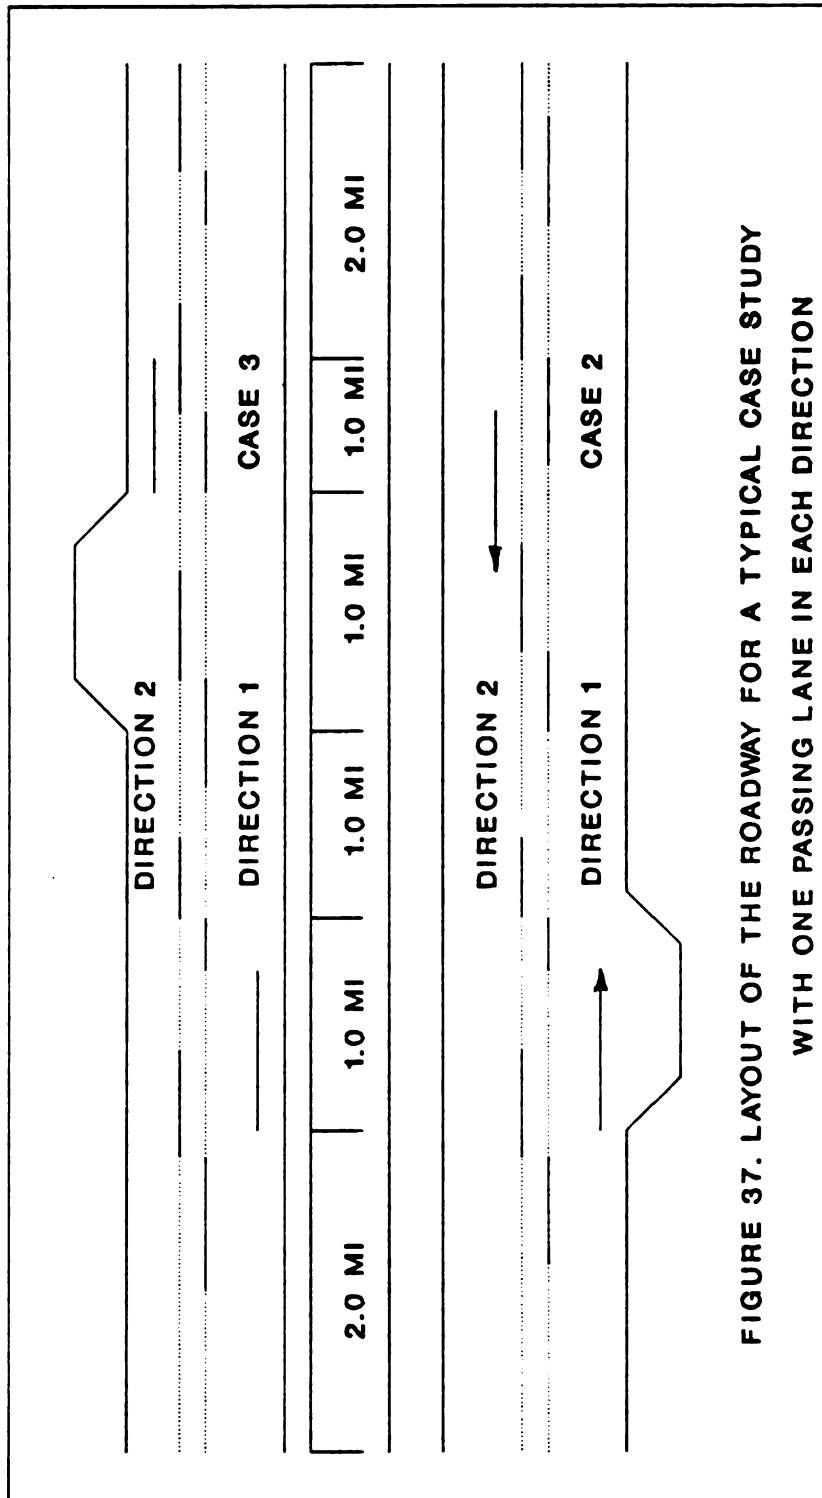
LAYOUT OF THE ROADWAY FOR A TYPICAL CASE STUDY WITH ONE PASSING LANE IN EACH DIRECTION
